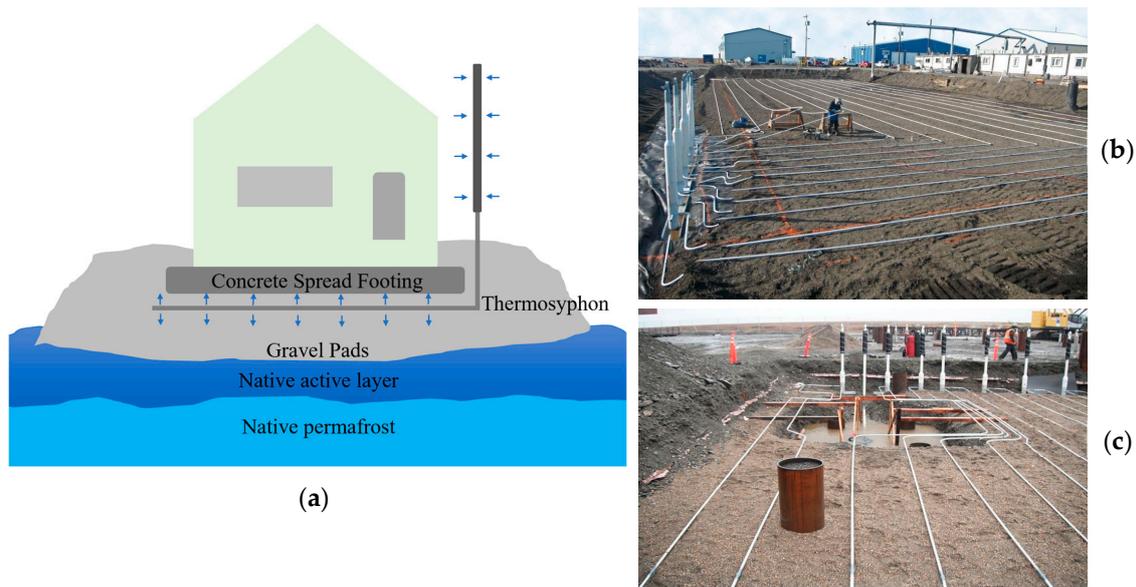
(a) Illustration of a concrete spread footing foundation with a thermosyphon (Drawings are not to scale); (b,c) Use of Flat Loop Thermosyphons in Nome and Point Lay, Alaska. Courtesy of <https://arcticfoundations.com/> accessed on 16 December 2023.
